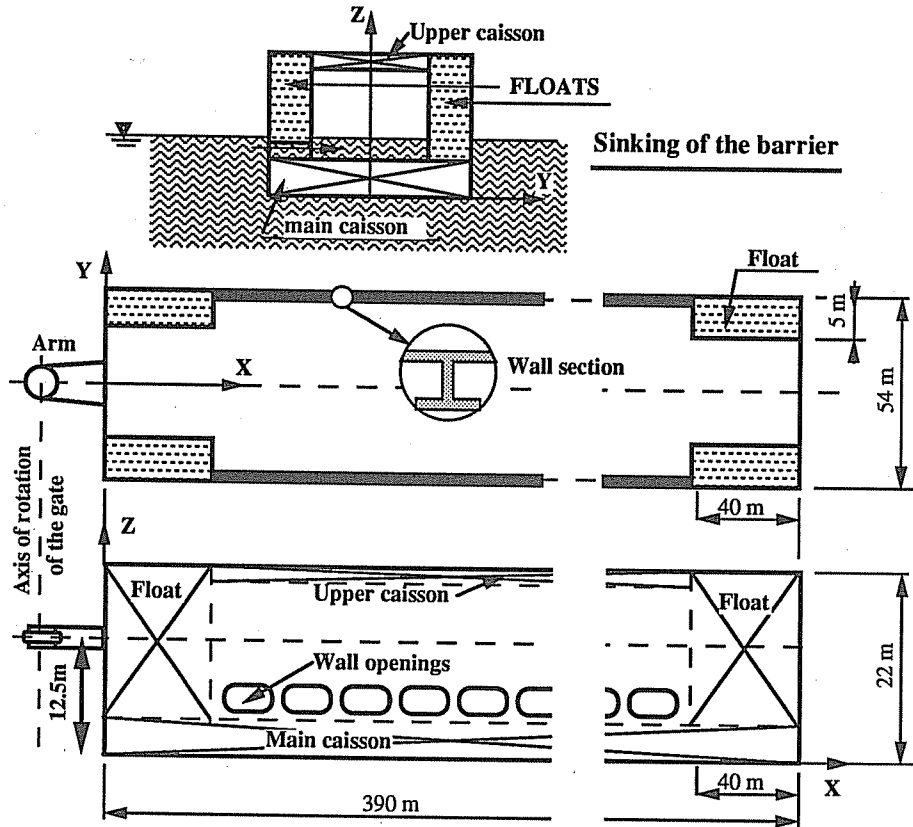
Details of the floating barrier (cross section, plan view and front view).
